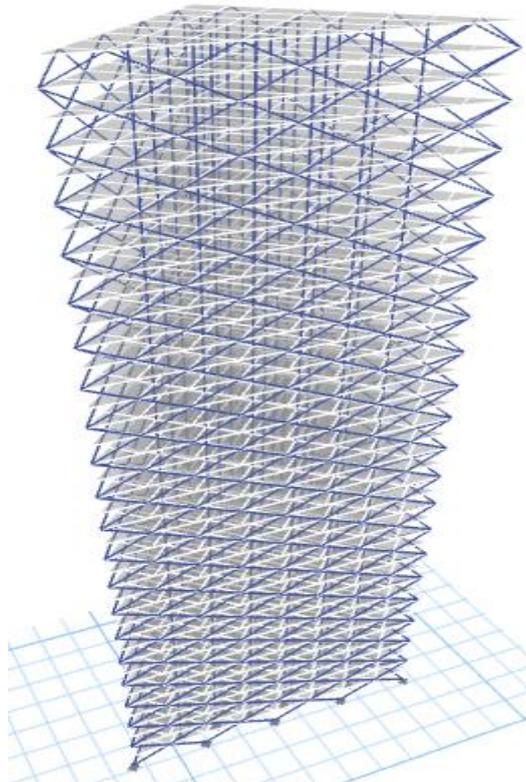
Elevation of G+40 Building with 2 storey module Diagrid system
